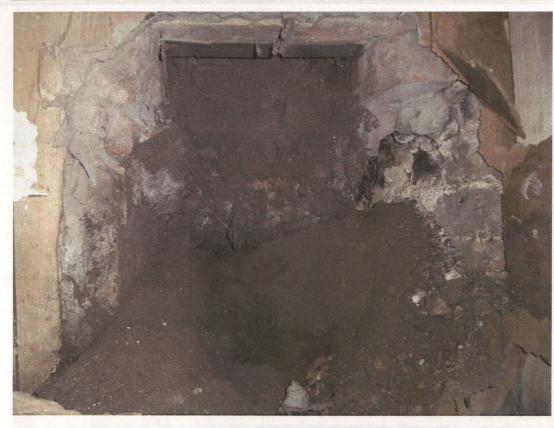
Interior of Room 1a,detail of exposed portion of fireplace behind stud partition wall, looking south
